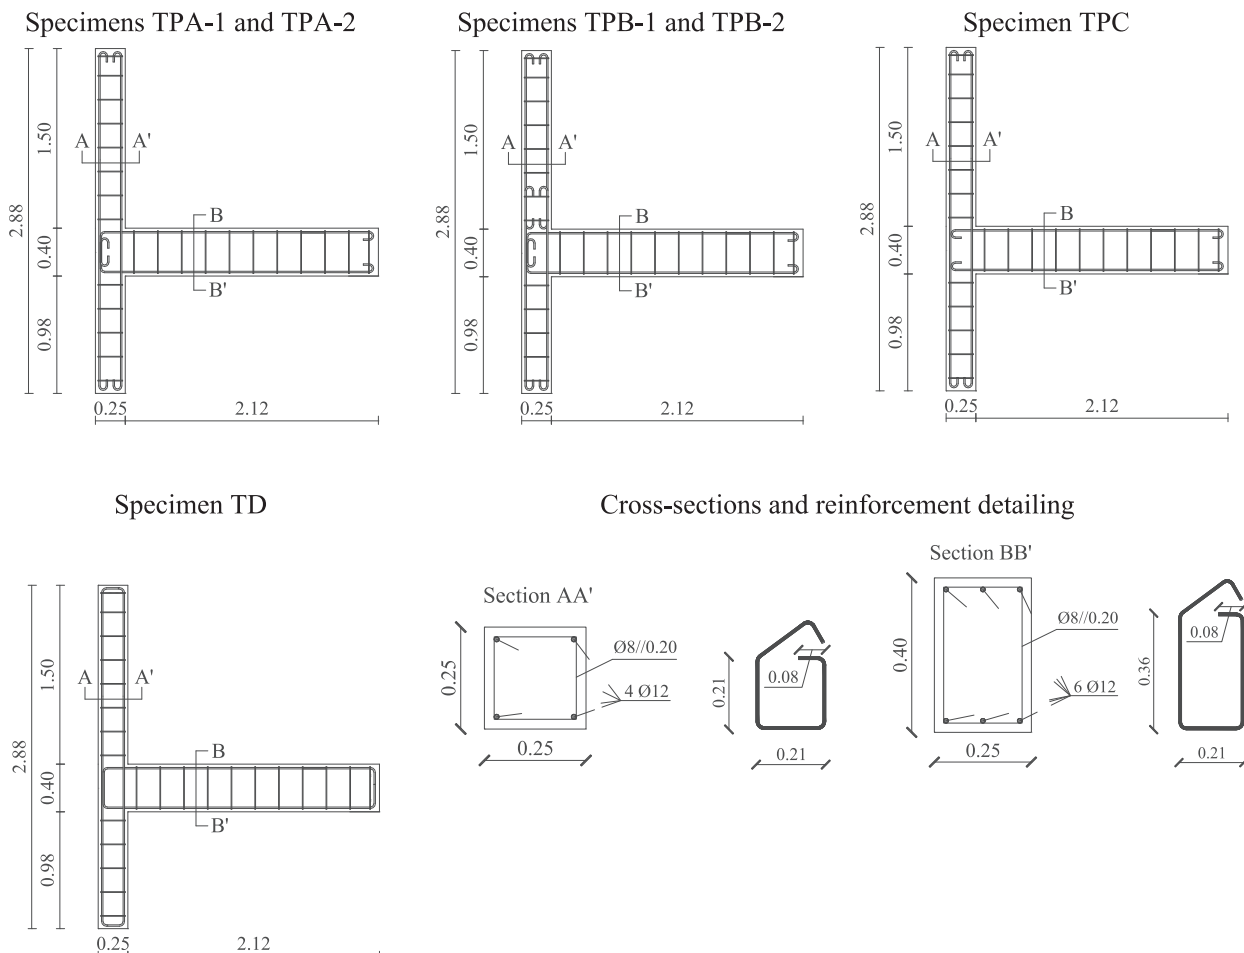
Specimens (geometry, dimensions and reinforcement detailing).
